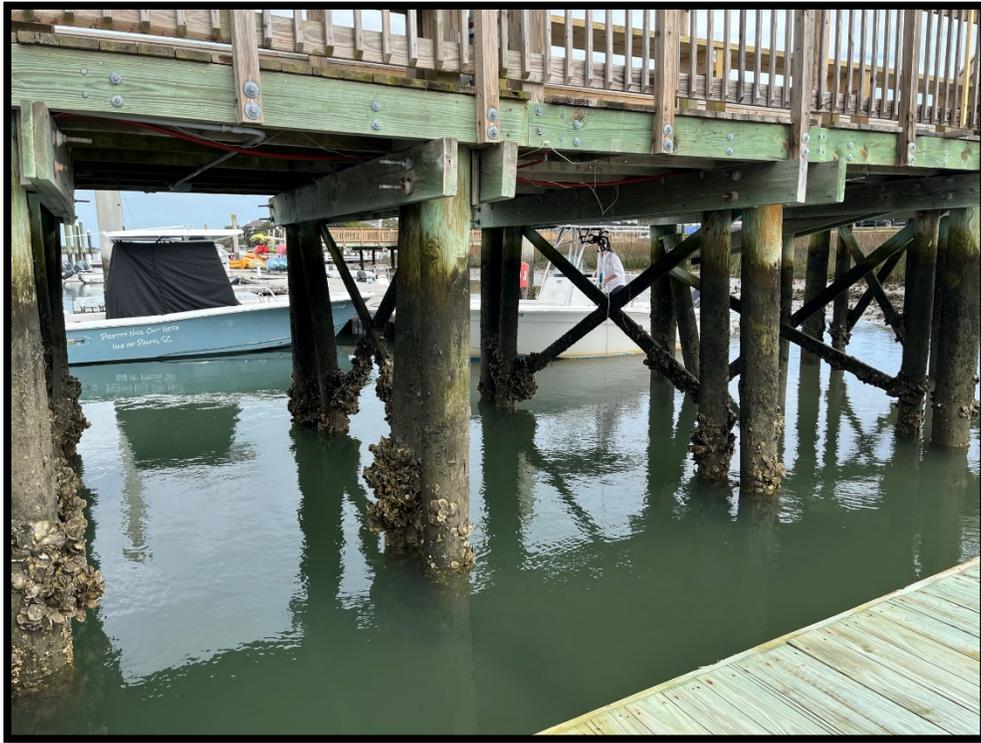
Timber Piles and Framing - Public Dock Access Pier
